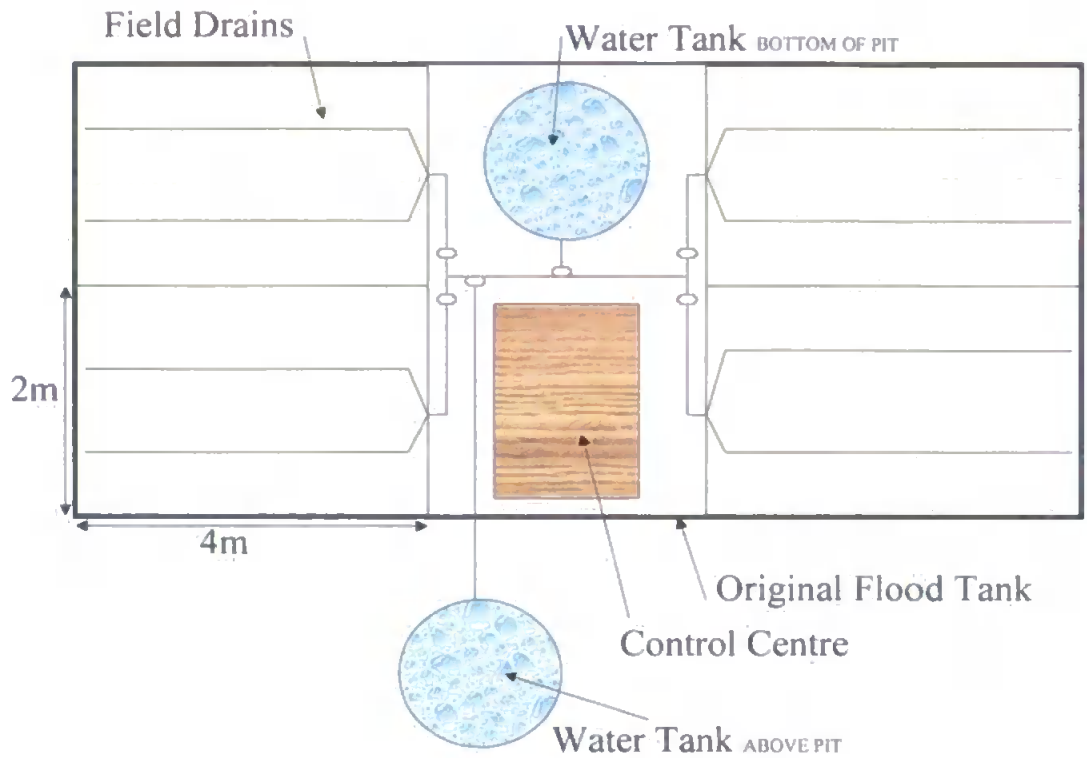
Shows a schematic layout and cross-section of the pits.
